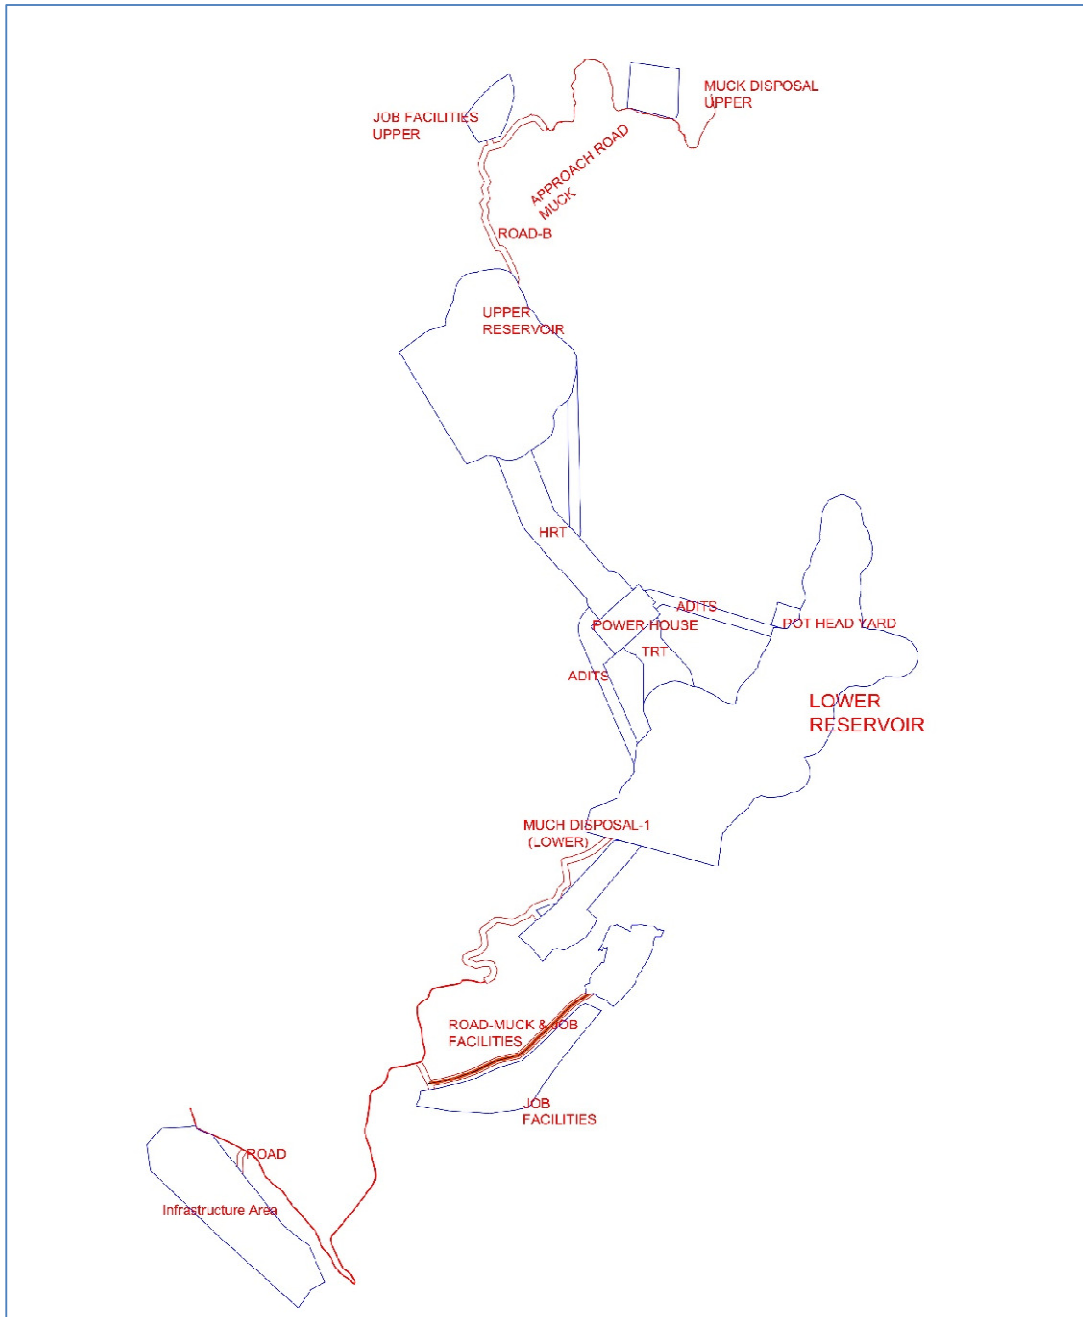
(a): PLANT LAYOUT SHOWING INFRASTRUCTURE
